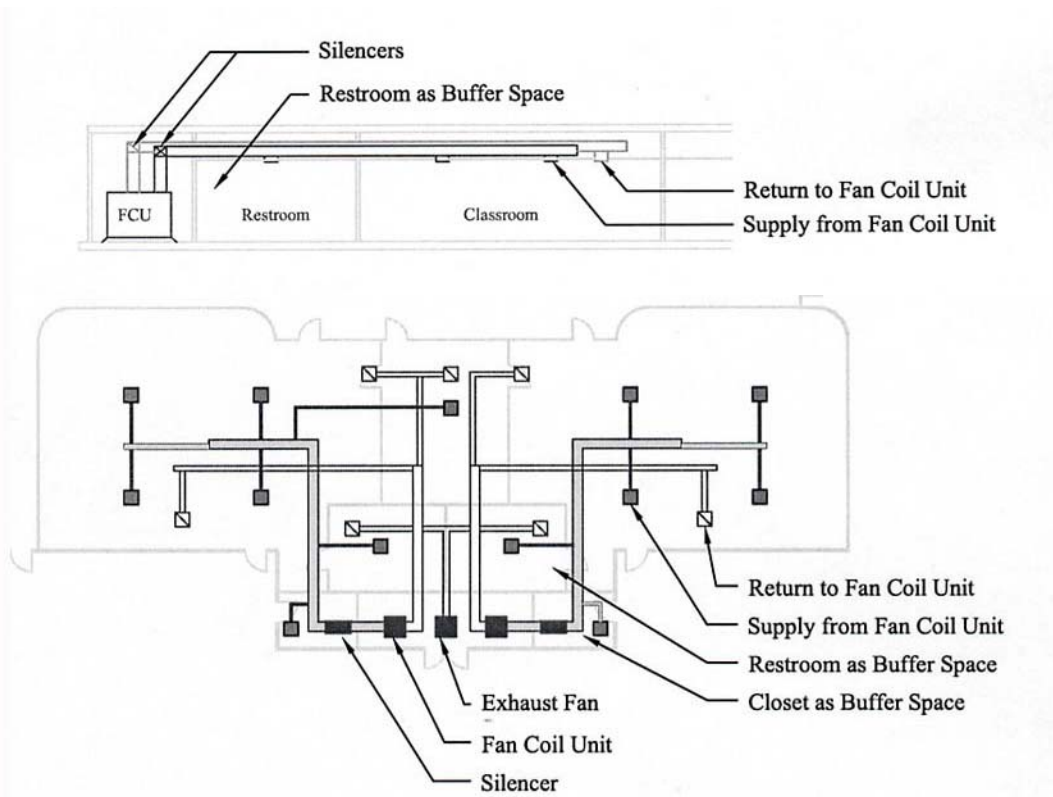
Conceptual section sketch and floor plan illustrating Case Study 3: Fan Coil Units in Separate Mechanical Rooms
